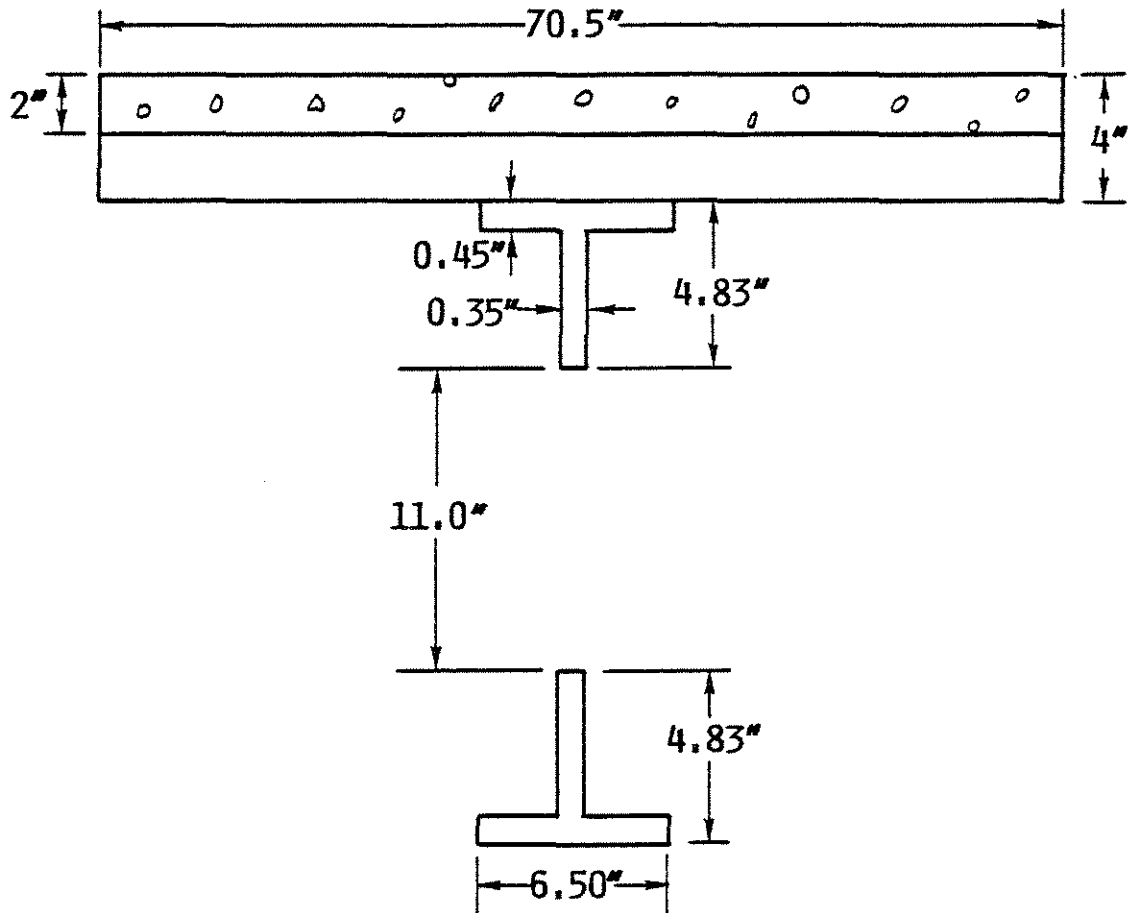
Cross-Section of Composite Beam in Design Example.
